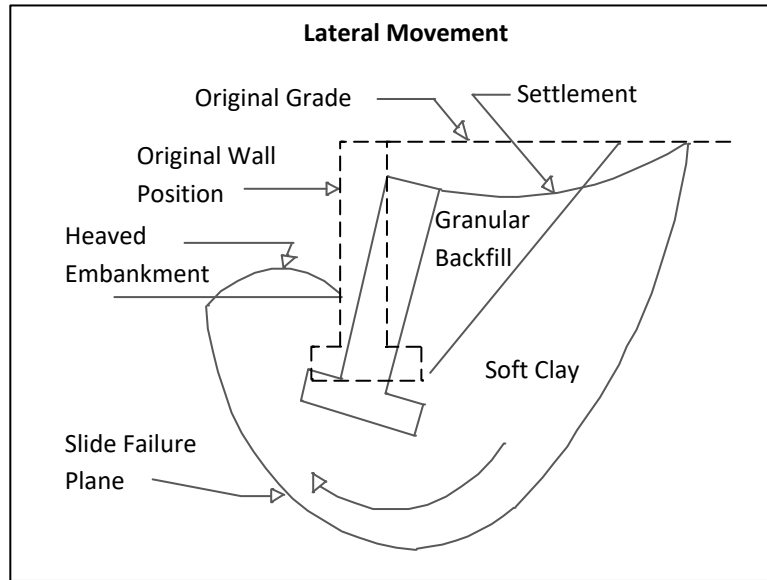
Lateral Movement and Rotation of a Retaining Wall Due to Slope Failure.
